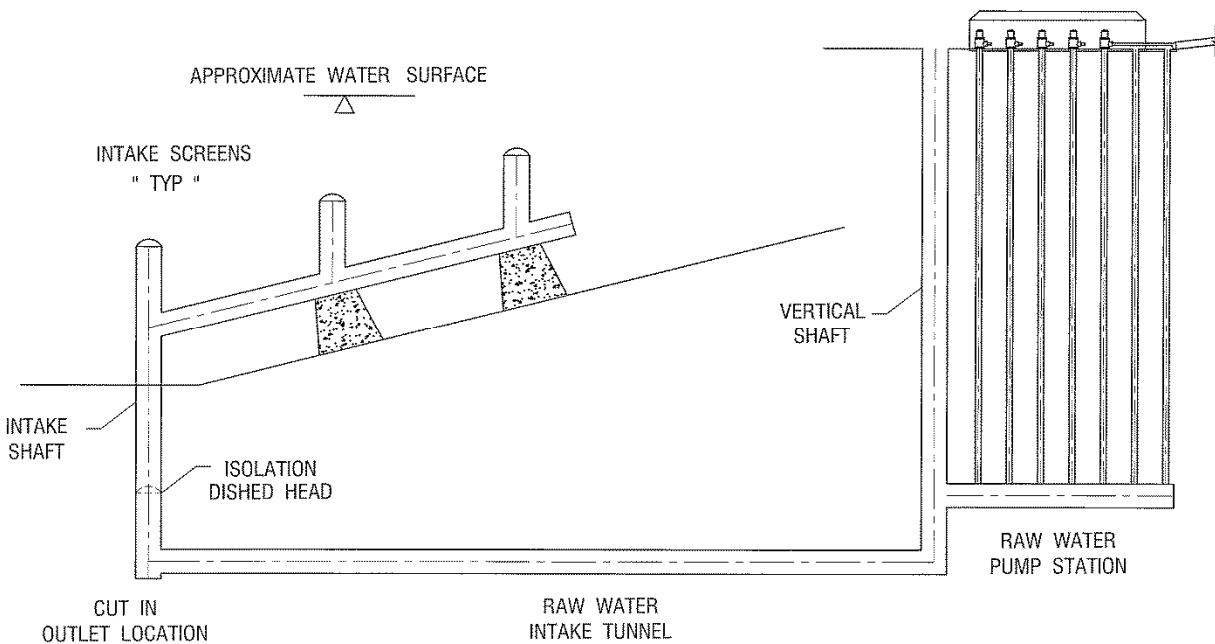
Hydraulic Profile Schematic for Austin Water Treatment Plant No. 4.
